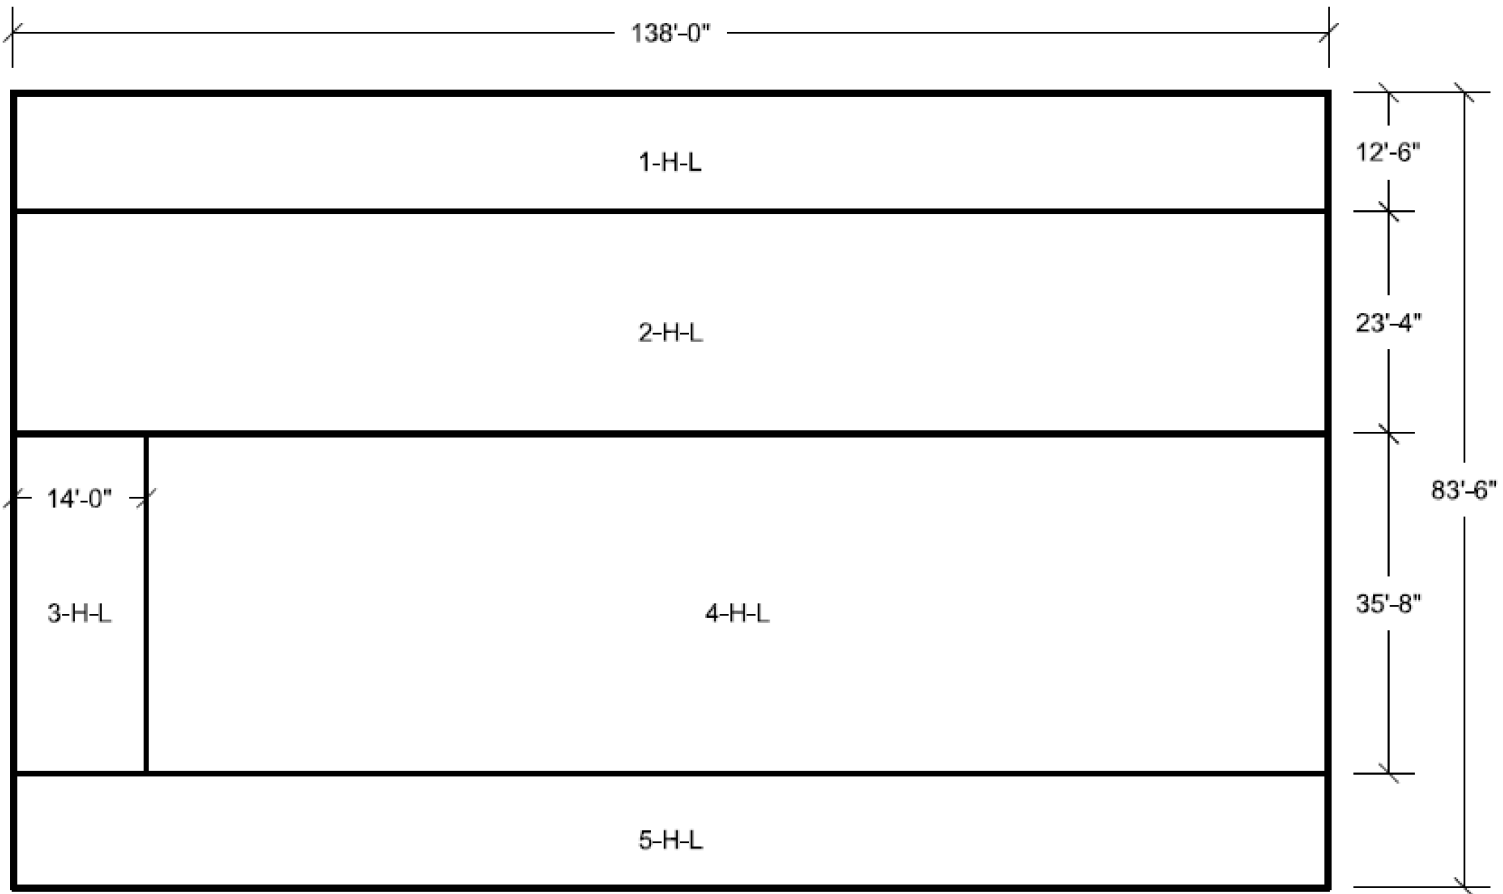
H.6-99 UHS Basin West Wall Looking East Horizontal Reinforcement Zones Far Side Face
